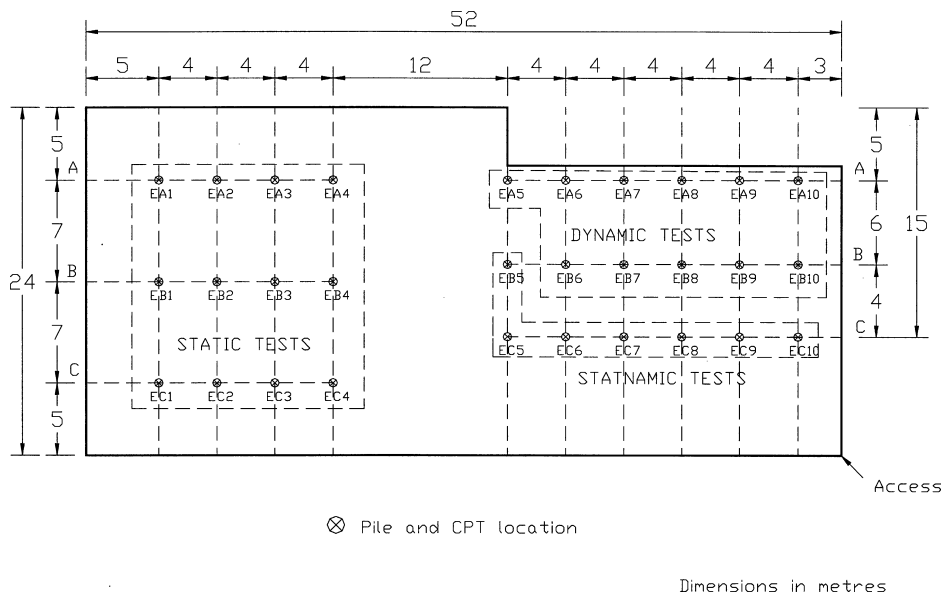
Layout of CPT and test piles at Limelette, Belgium.
